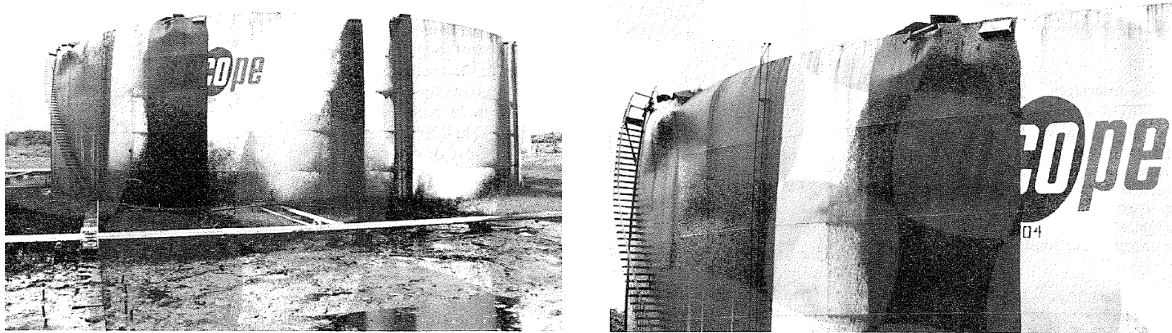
Overall view of the 12.19 m high by 44.2 m diameter oil storage tank showing oil spillage from top vents and from rupture of roof-wall junction (a); close-up of wall buckling and rupture of joint between steel plates at roof-wall junction (b)
